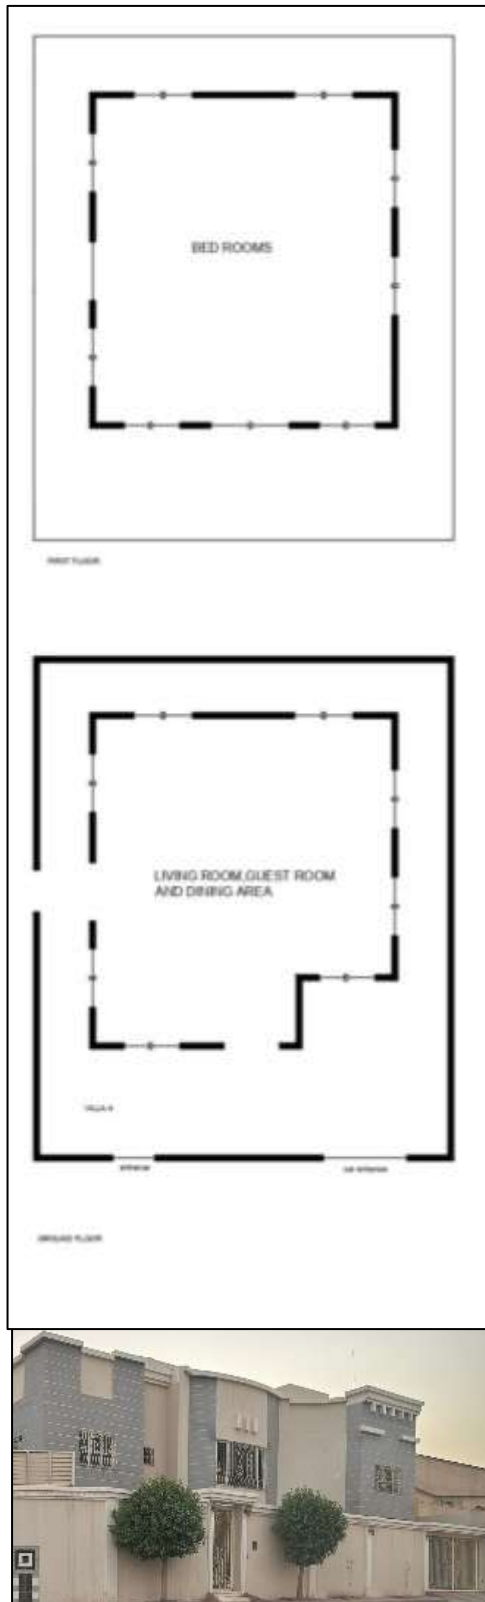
Villa House Plans and Elevation of Detached Type by the Author.
